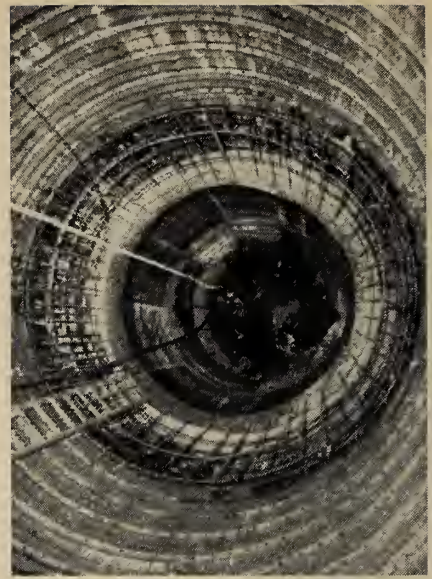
Stripping forms from concrete shell east shaft, Red River Tunnel prior to commencing rock excavation.
